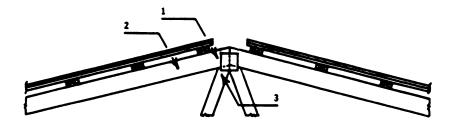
Location of test sites, Barn H. Truss No. 1, 4.9m (16') from north end. South elevation. Raised ridge cap, bird netting not shown.
